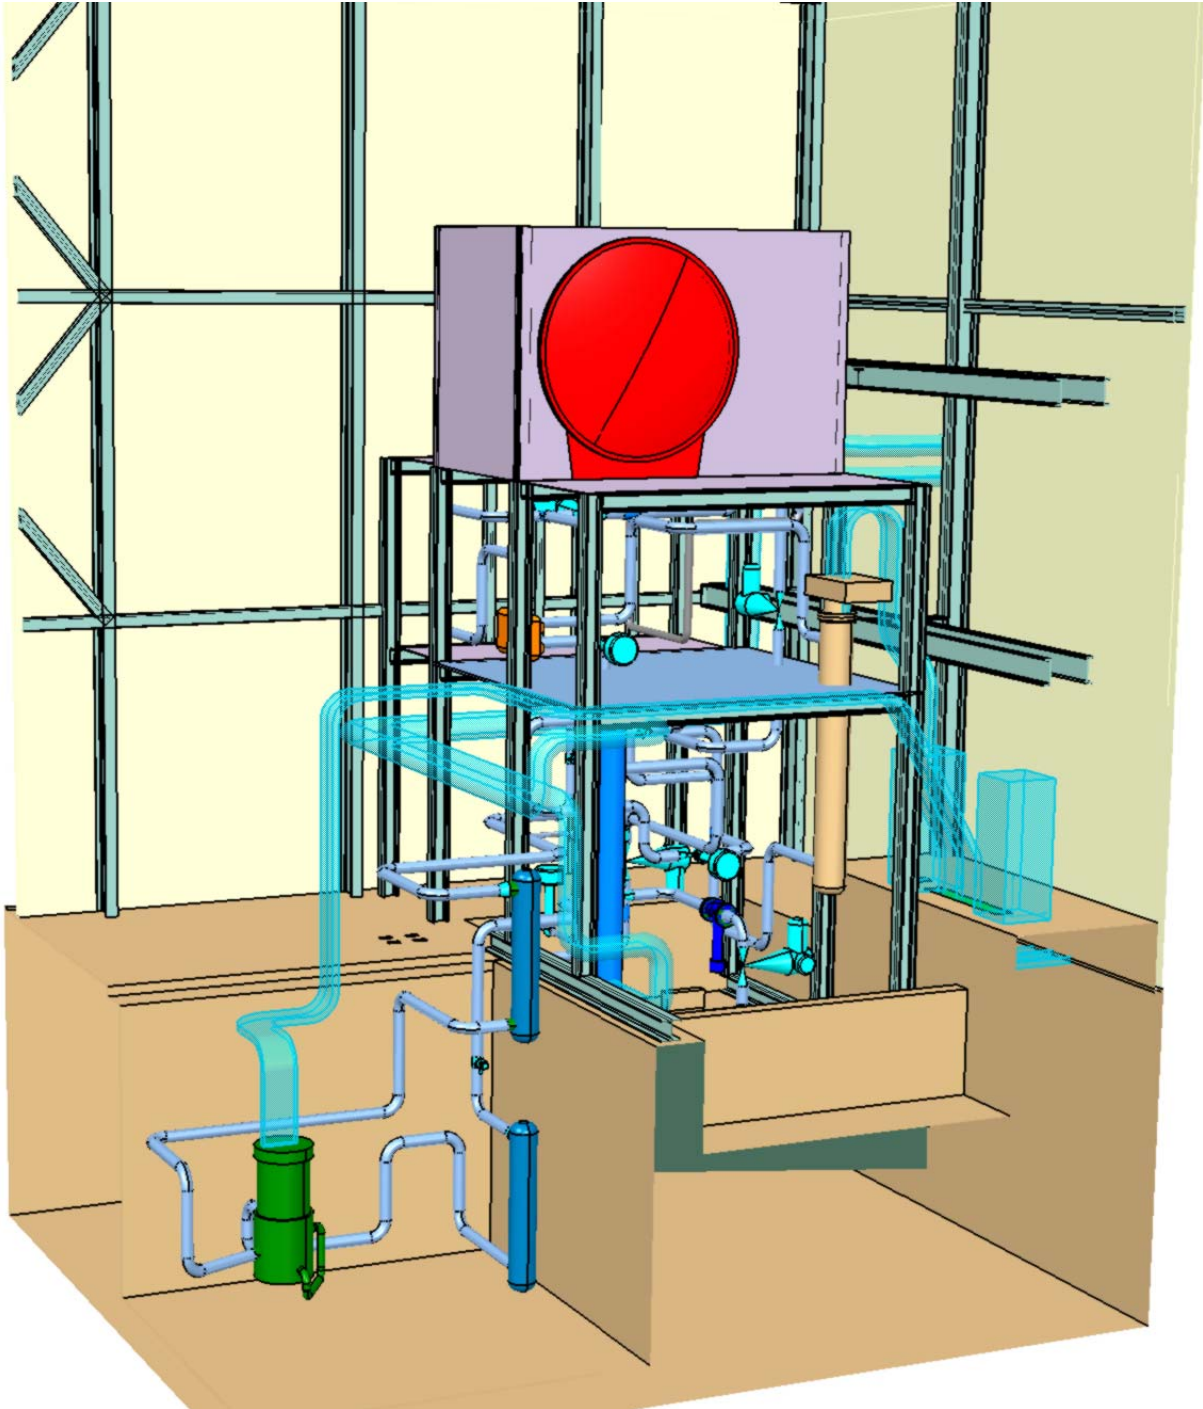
HELOKA layout: current equipment arrangement and helium piping; water pipe and electrical cables space reservation is shown.
